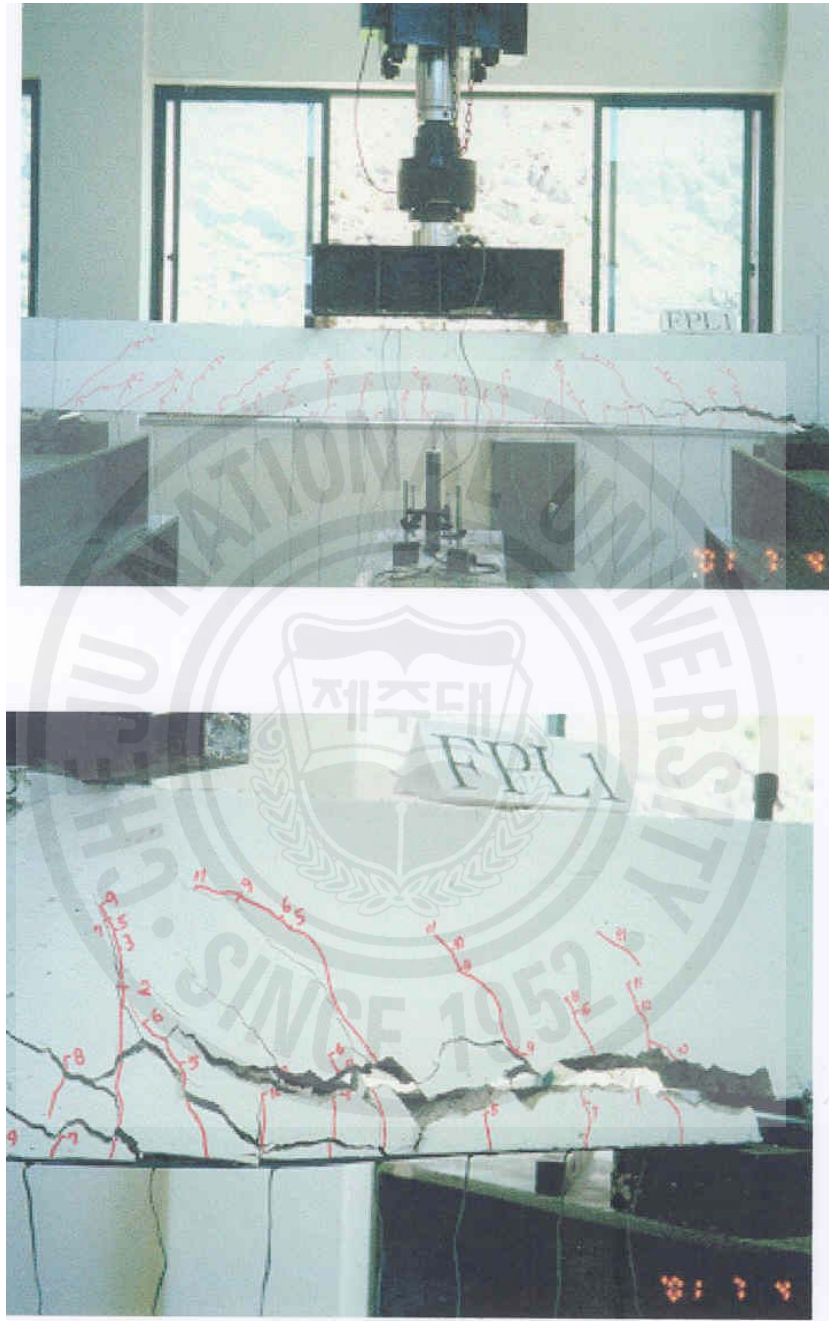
Concrete cover failure of beam FPL1
